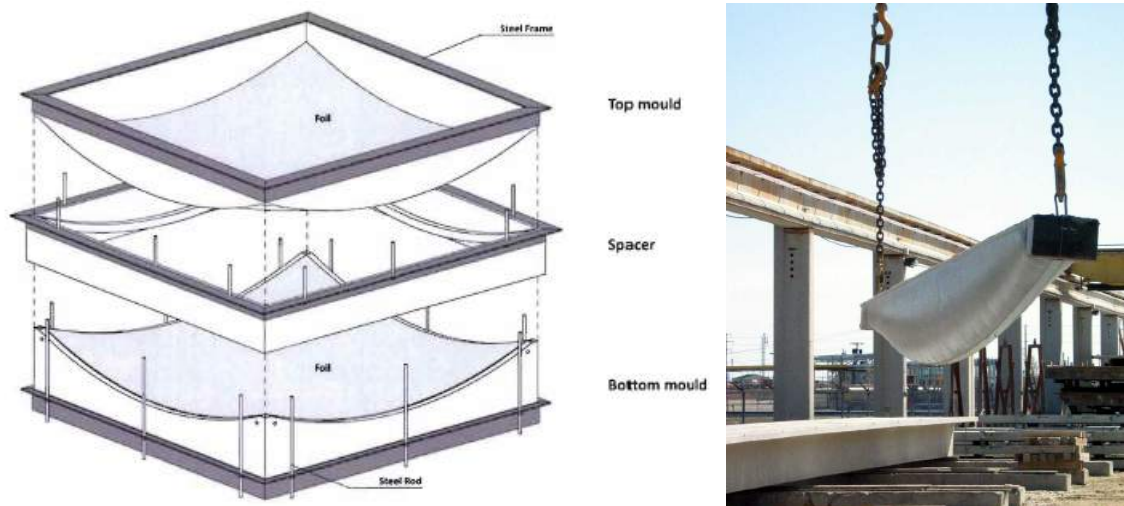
(a) Fabric mould (b) Fabric moulded beam
